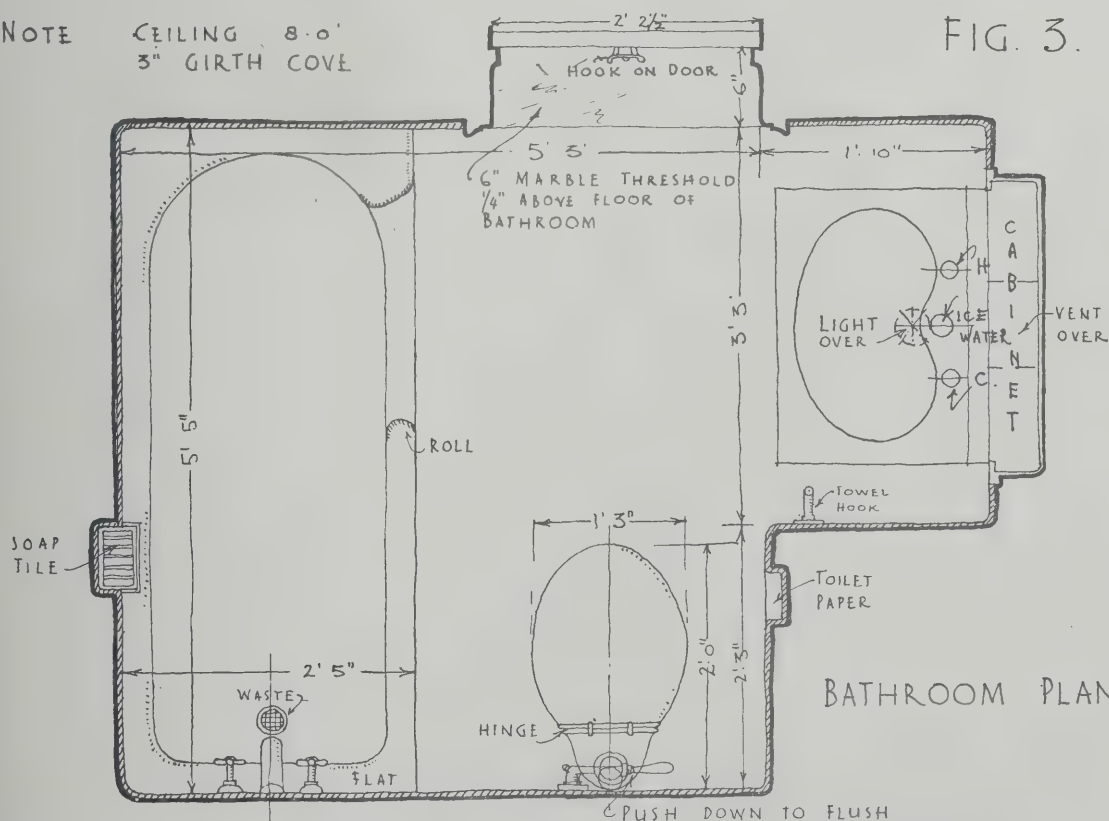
THE PENNSYLVANIA HOTEL, NEW YORK: LAYOUT OF A TYPICAL BATHROOM, SHOWING SIZES OF FIXTURES. MESSRS. MCKIM, MEAD & WHITE, Architects.
